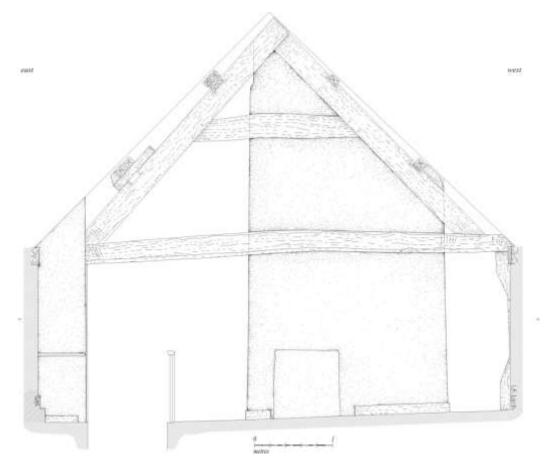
Principal range roof structure – northern surviving truss (truss IIII), upper (north) side
